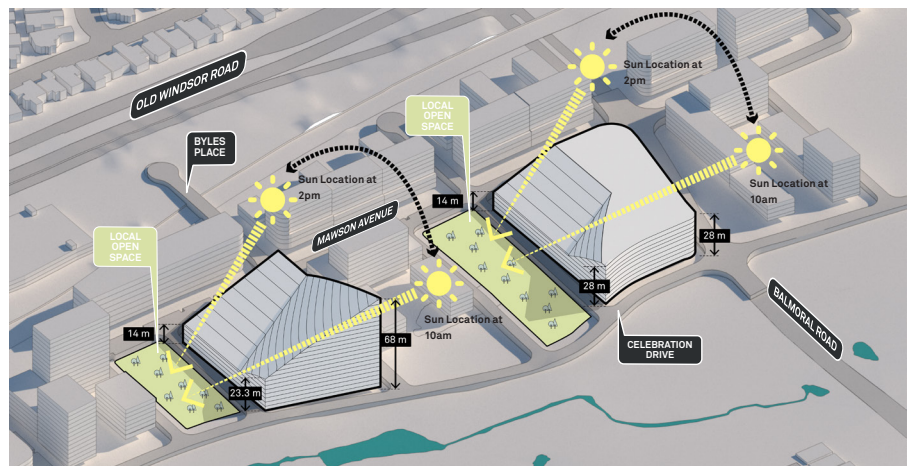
3d view of local parks showing overshadowing at 12pm on Winter Solstice from proposed building envelope
